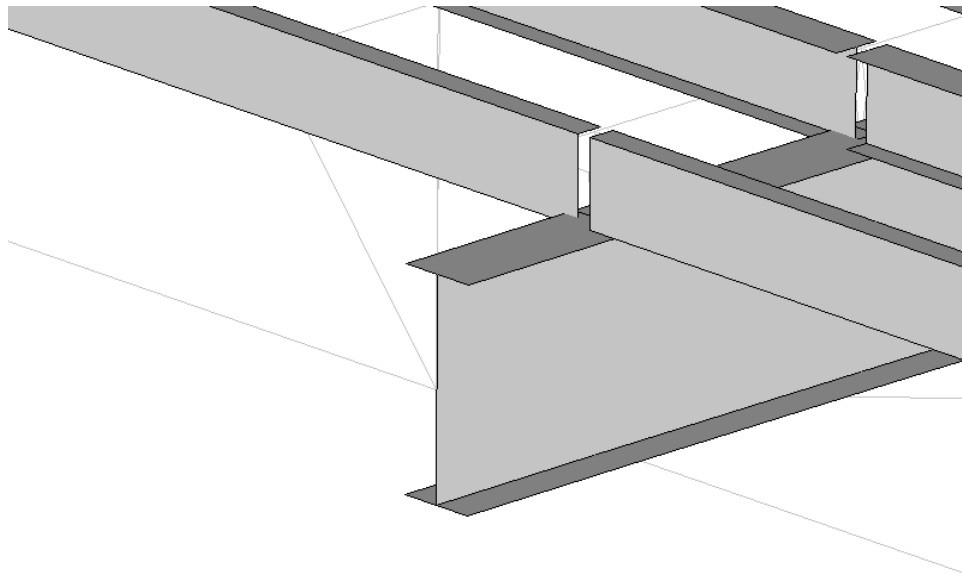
Prowers Bridge. Rendering of steel stringers on steel floor beam.
